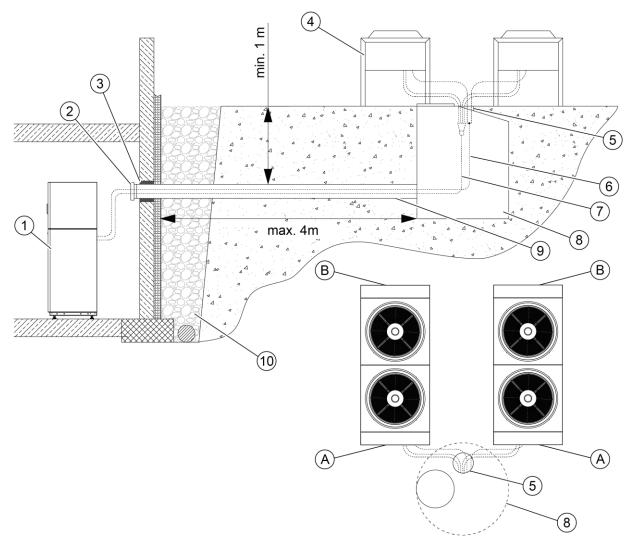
Schematic diagram of buried connection pipework with the installation shaft with AIR 80 C22A. Top: Cross section; bottom: Evaporator and installation shaft, plan view
